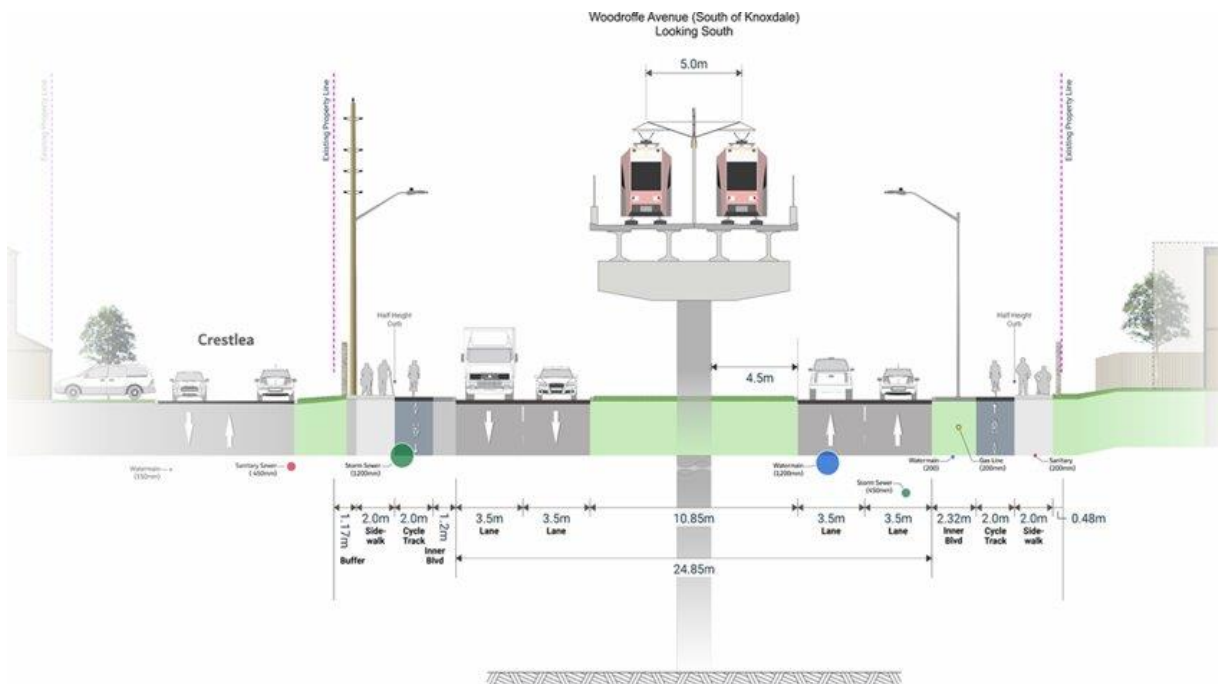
A – Woodroffe Avenue Median LRT (Knoxdale Road to West Hunt Club Road)
